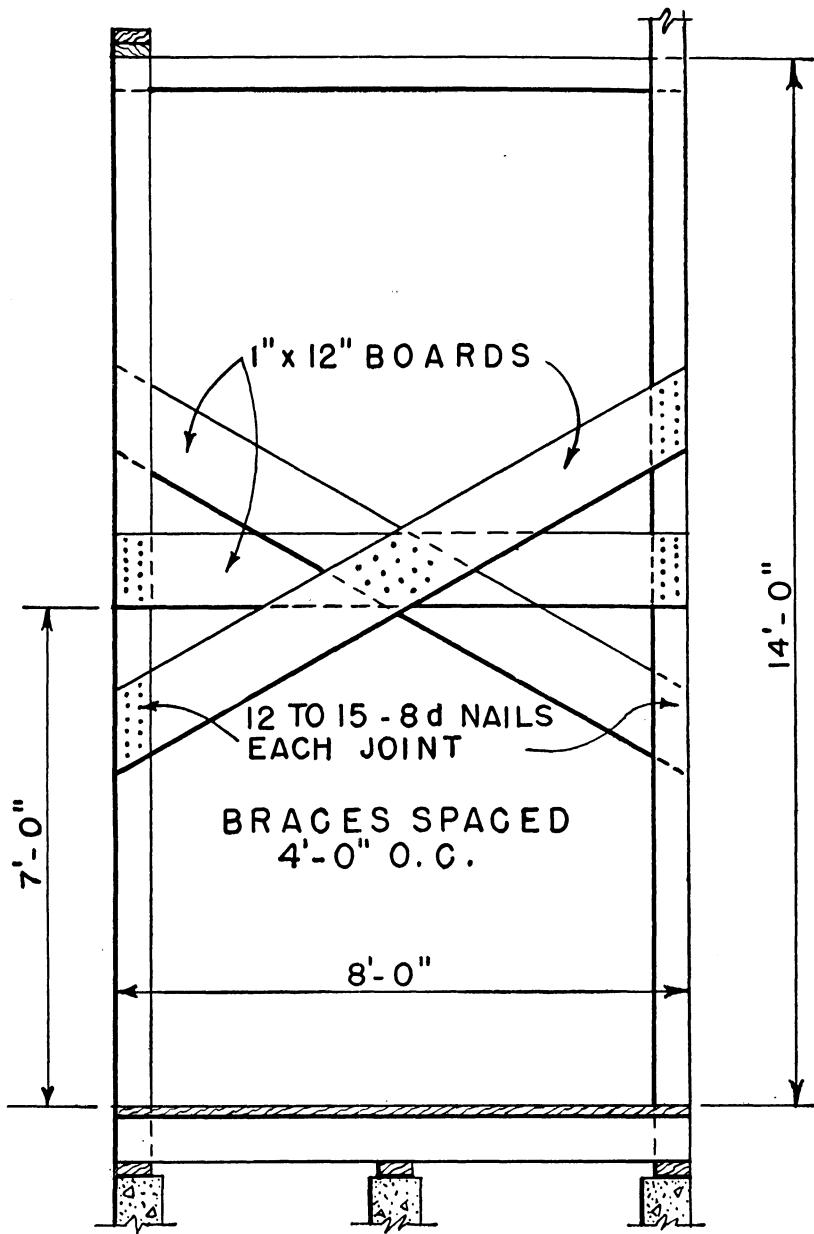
Cross braces formed of three 1- by 12-inch boards will withstand heavy vertical loads of corn as it settles in the crib. Joints can be nailed with eightpenny nails.
